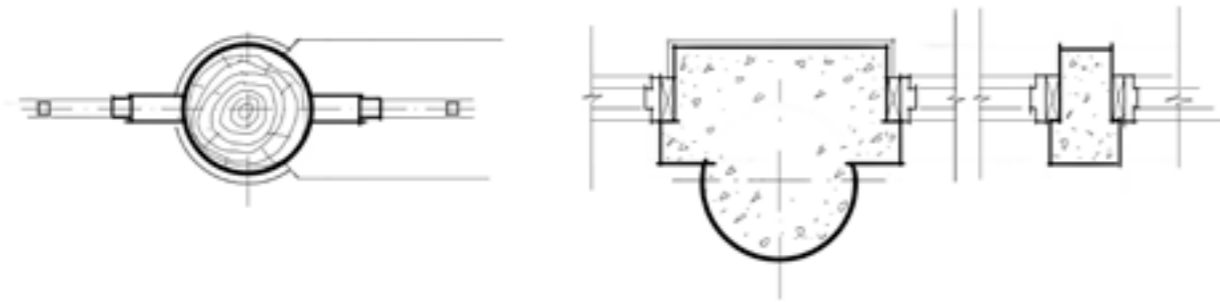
Comparison of real wood columns in traditional Chinese construction versus engaged columns in Murphy's concrete wall assembly (Drawing by the author after Sicheng Liang, *Qingshi Yingao Zeli*, and Murphy's Junior College building in Yenching)
